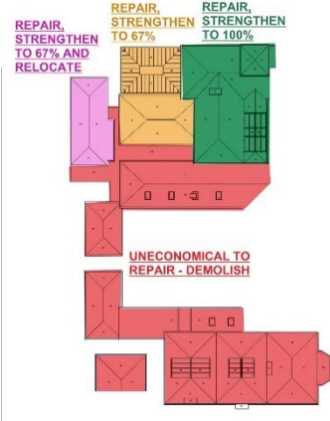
Plan of club showing the “plan for existing buildings” (original background Warren and Mahoney 2012)
